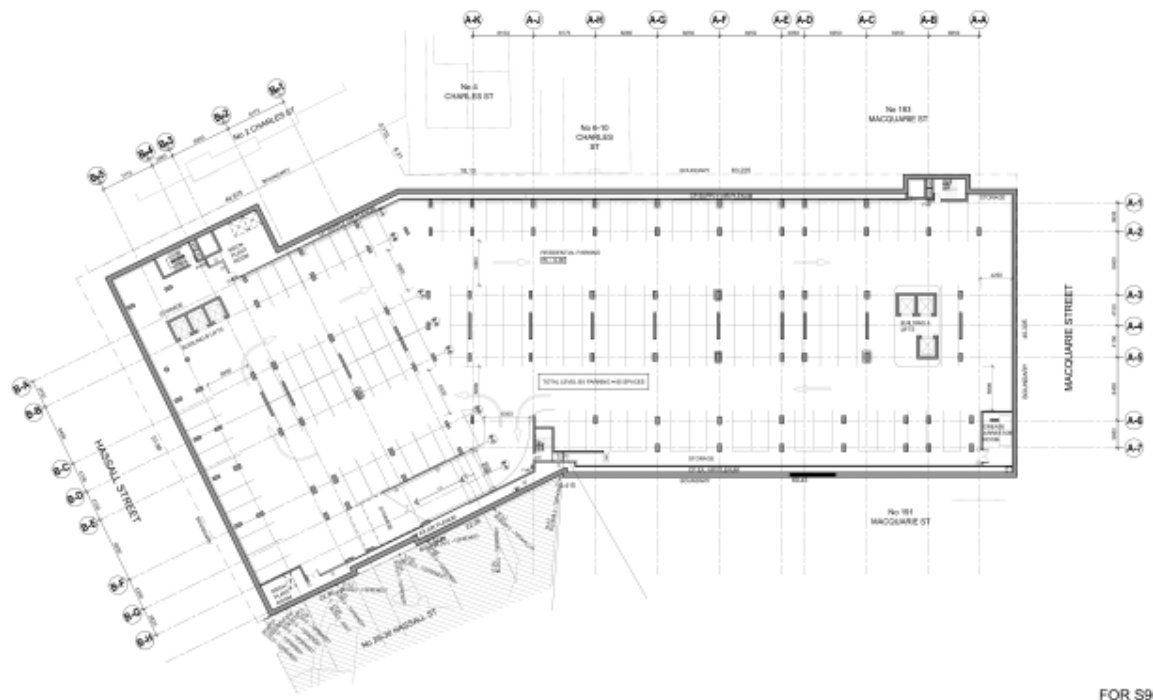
Proposed Basement Level 5 Plan (Residential Car Park) (Source: KTA, 2015)
